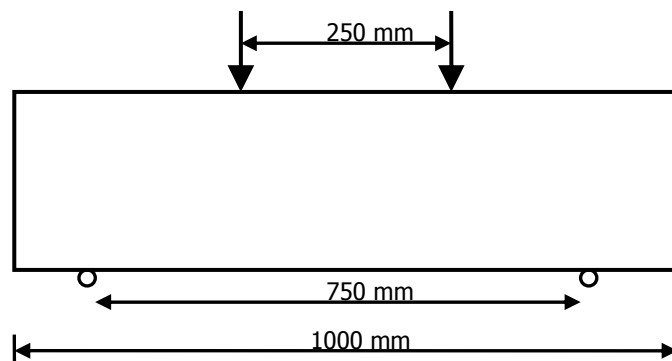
Beam dimensions for the four point bending test. Beams have a 125 mm square cross section; in case of notched tests, a 20 mm notch was cut at midspan.
